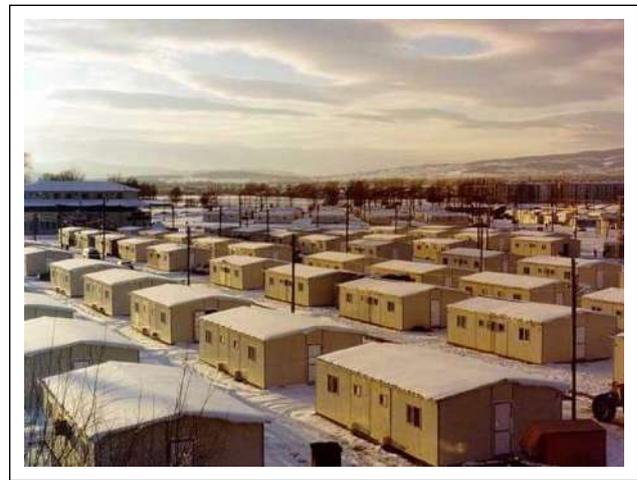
Prefabricated concrete was used to construct temporary shelters [5].
